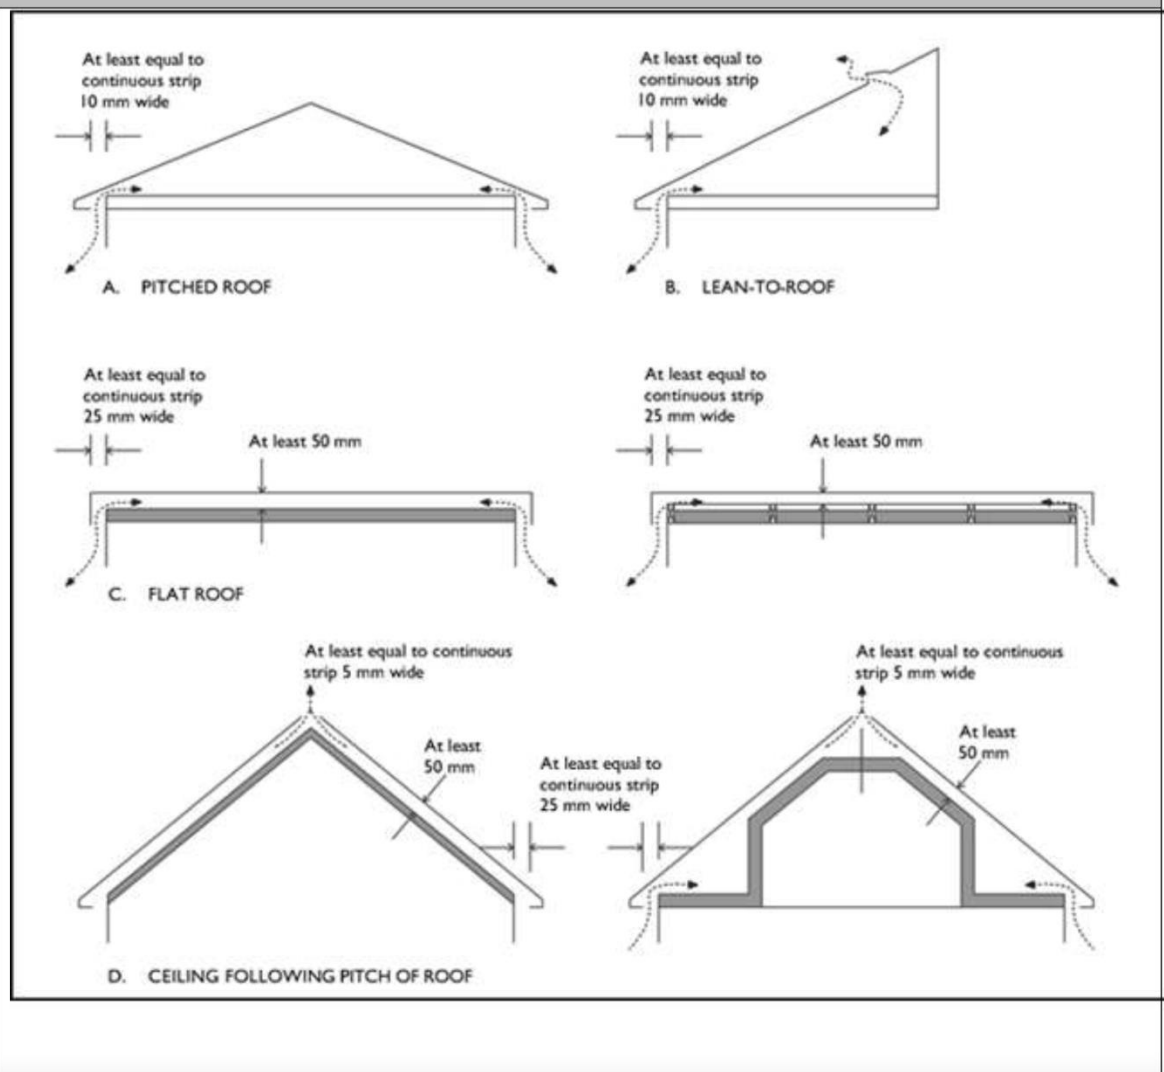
Diagram 11 from TGD Part F⁵³ - Ventilating roof voids – minimum ventilation gaps recommended to allow sufficient air movement over the insulation to remove excess moisture.
